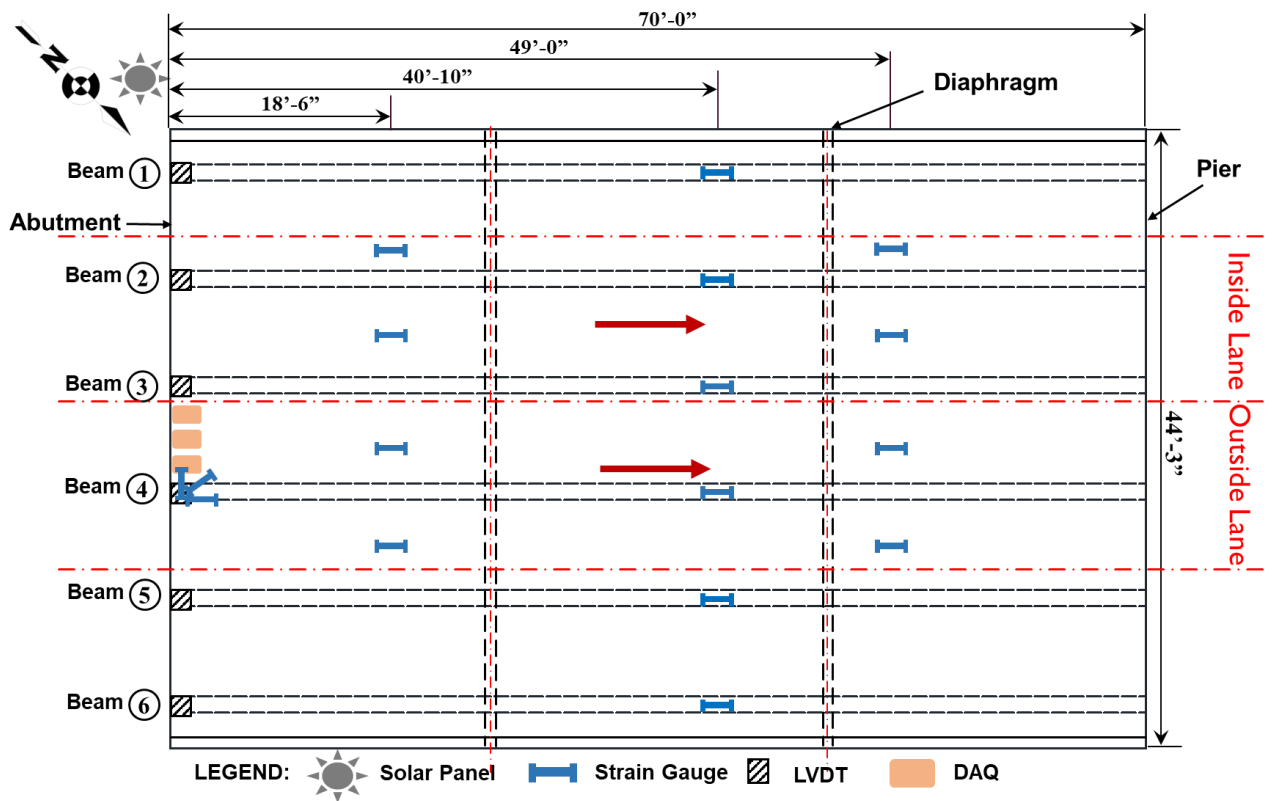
Sensor Layout for Bridge #1 (Plan View).
